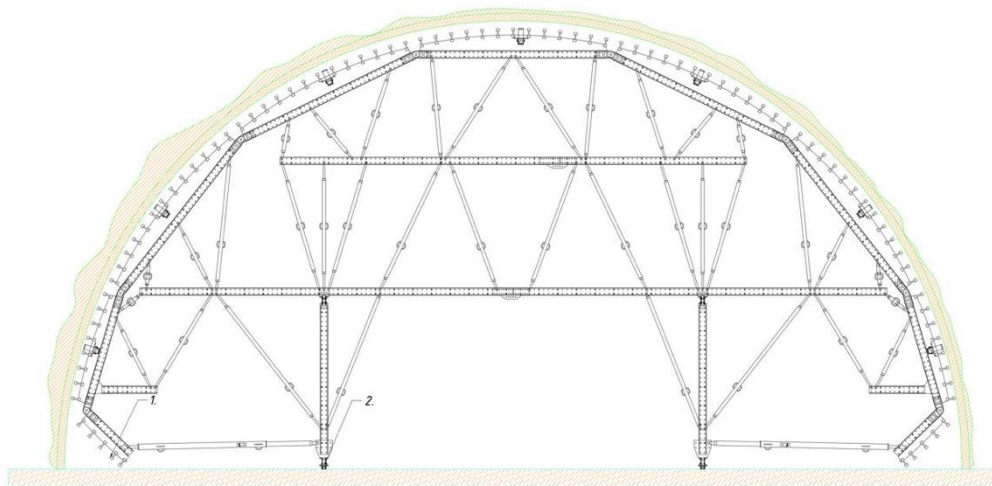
Lowering the Formwork Structure and Moving to the Next Sections
